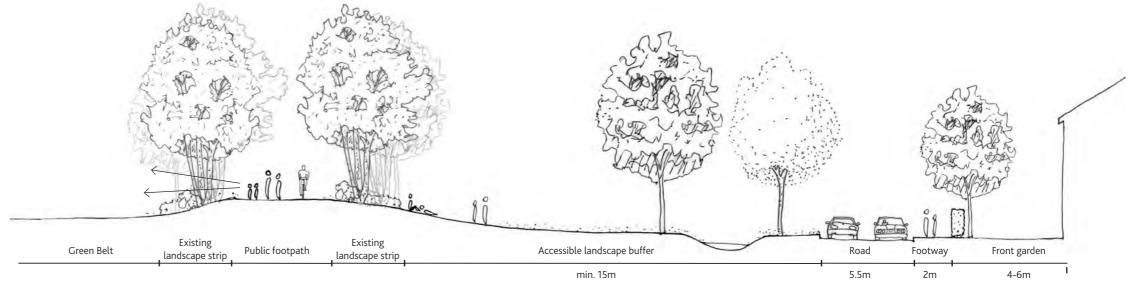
Typical street section 10 - Active Travel Route linking the disused railway line at the north of the site
